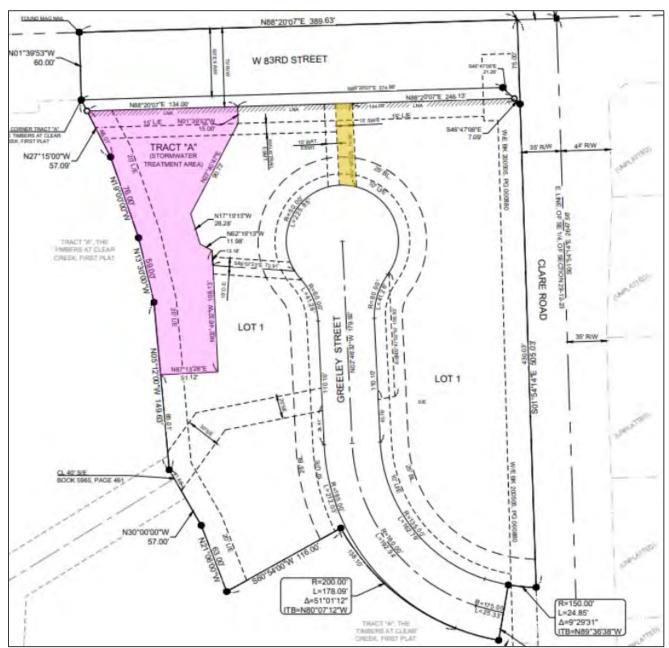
Final Plat with Tract "A" and Sidewalk Easement.
